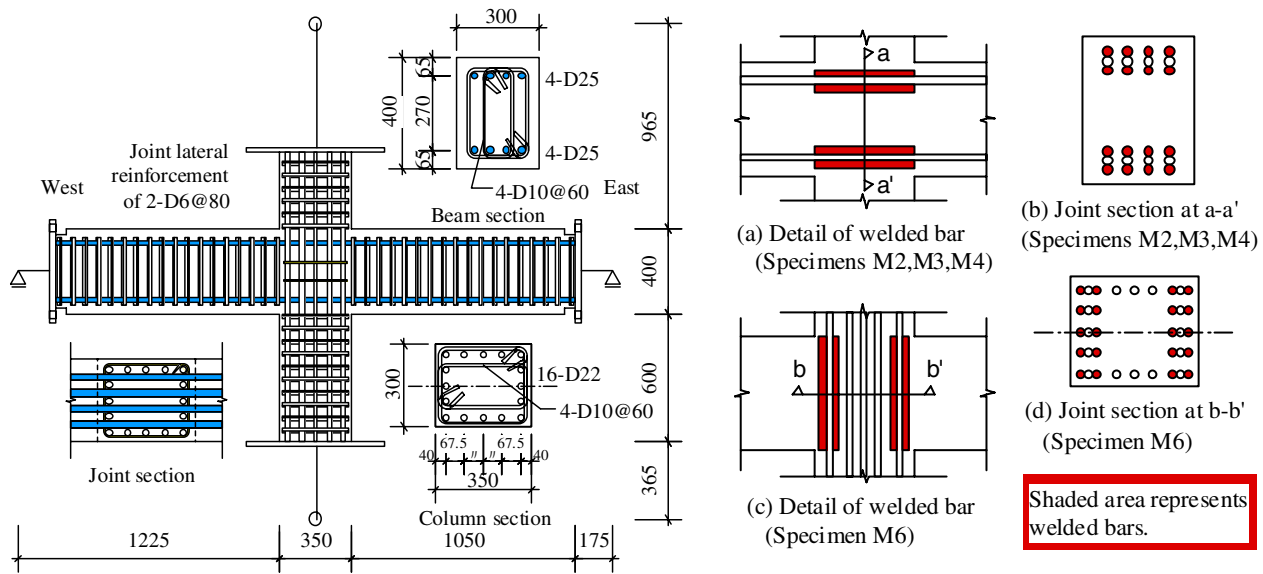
Section dimensions and reinforcement details Figure 2: Details of welded bar in a joint
